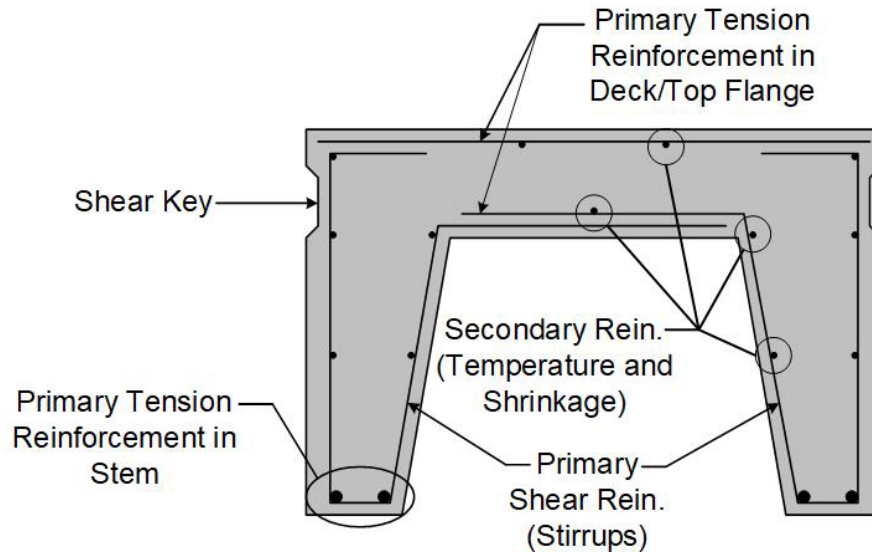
Steel Reinforcement in a Precast Channel Beam
